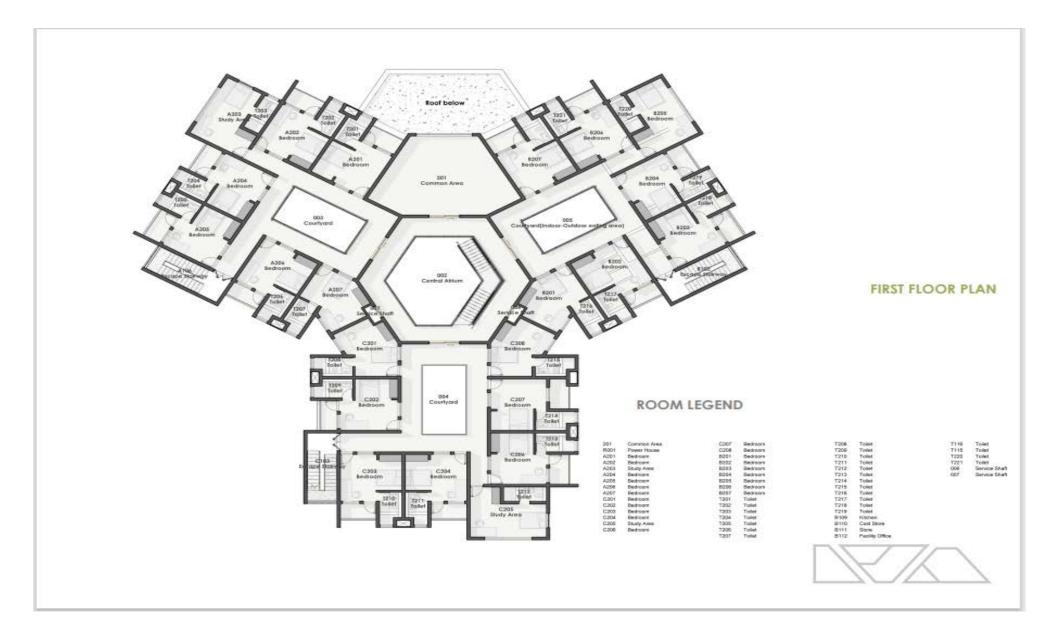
Proposed First Floor Design of the ACEPHAP Project
